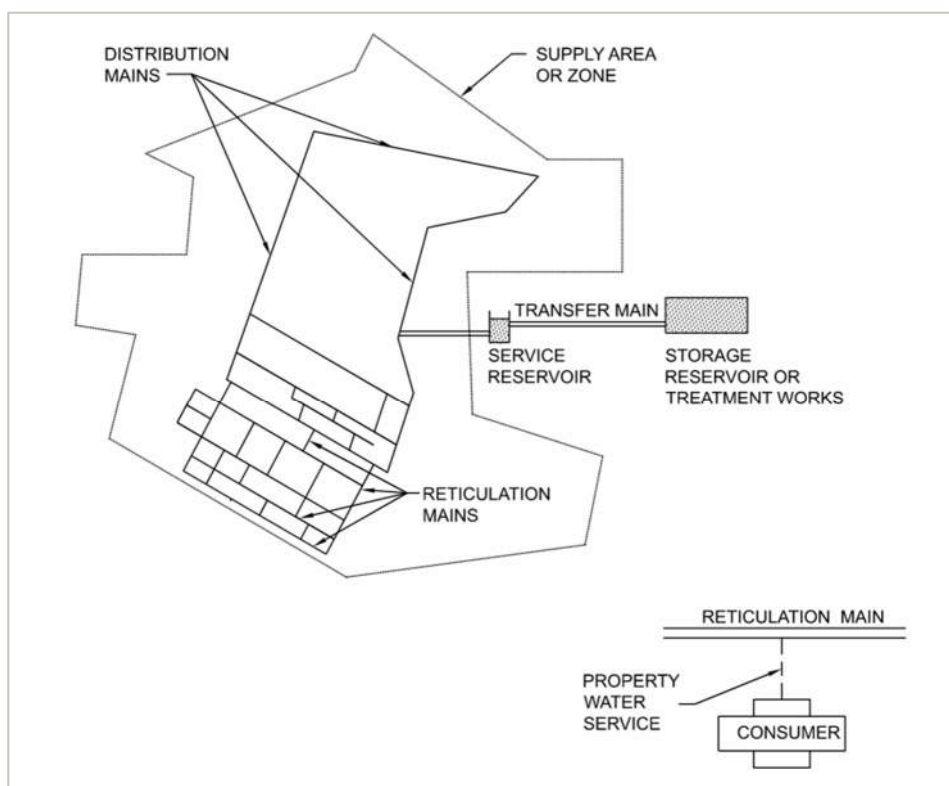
Components of a Typical Water Supply System (source: WSA03)
